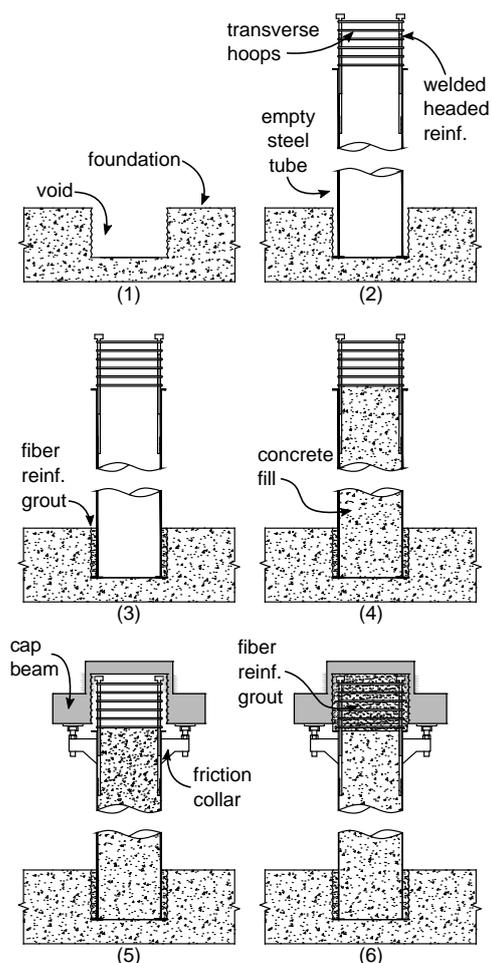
C Construction Sequence for Welded Dowel Connection
